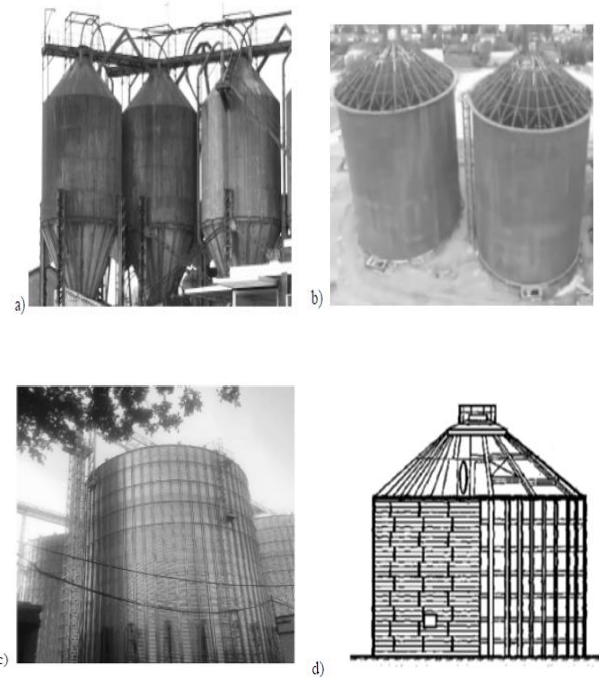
Different types of metal silos: a, b) welded silos; c) panel type; d) panel frame type [49].
